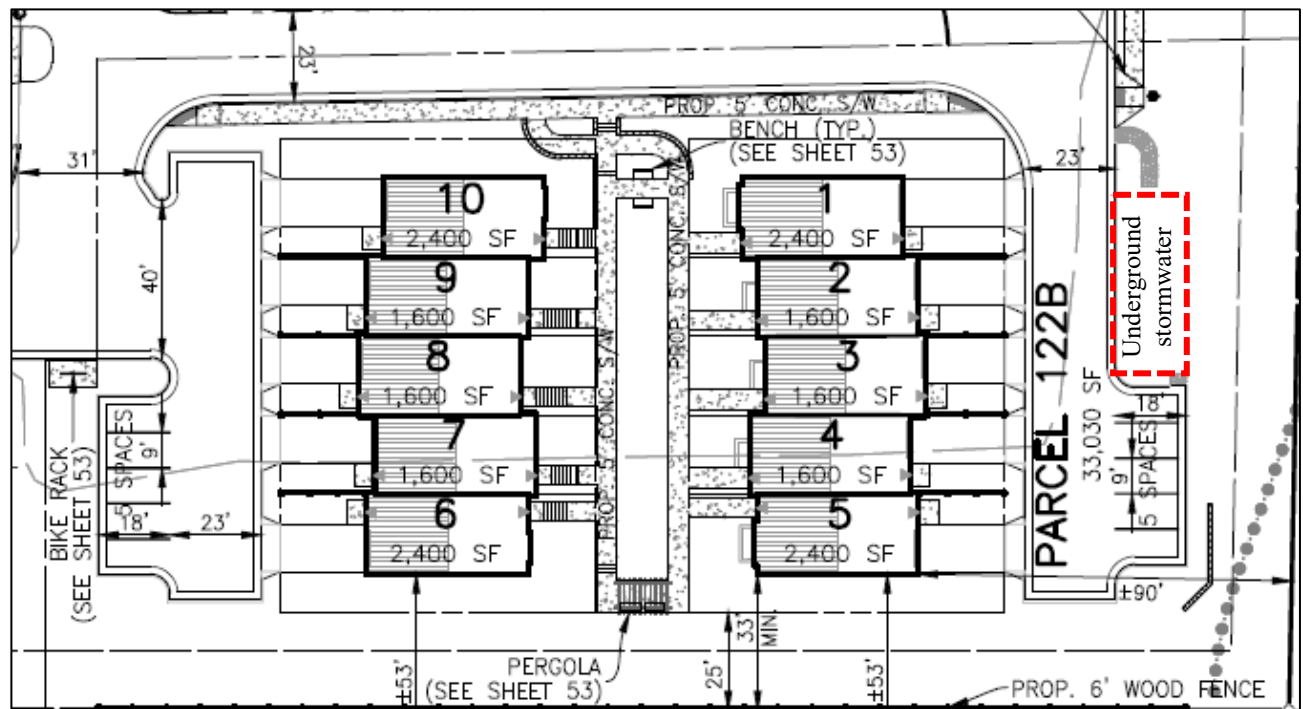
(next page) shows the proposed locations for the underground stormwater improvements for the new parking lot in Phase Two in the Master Development Plan.
